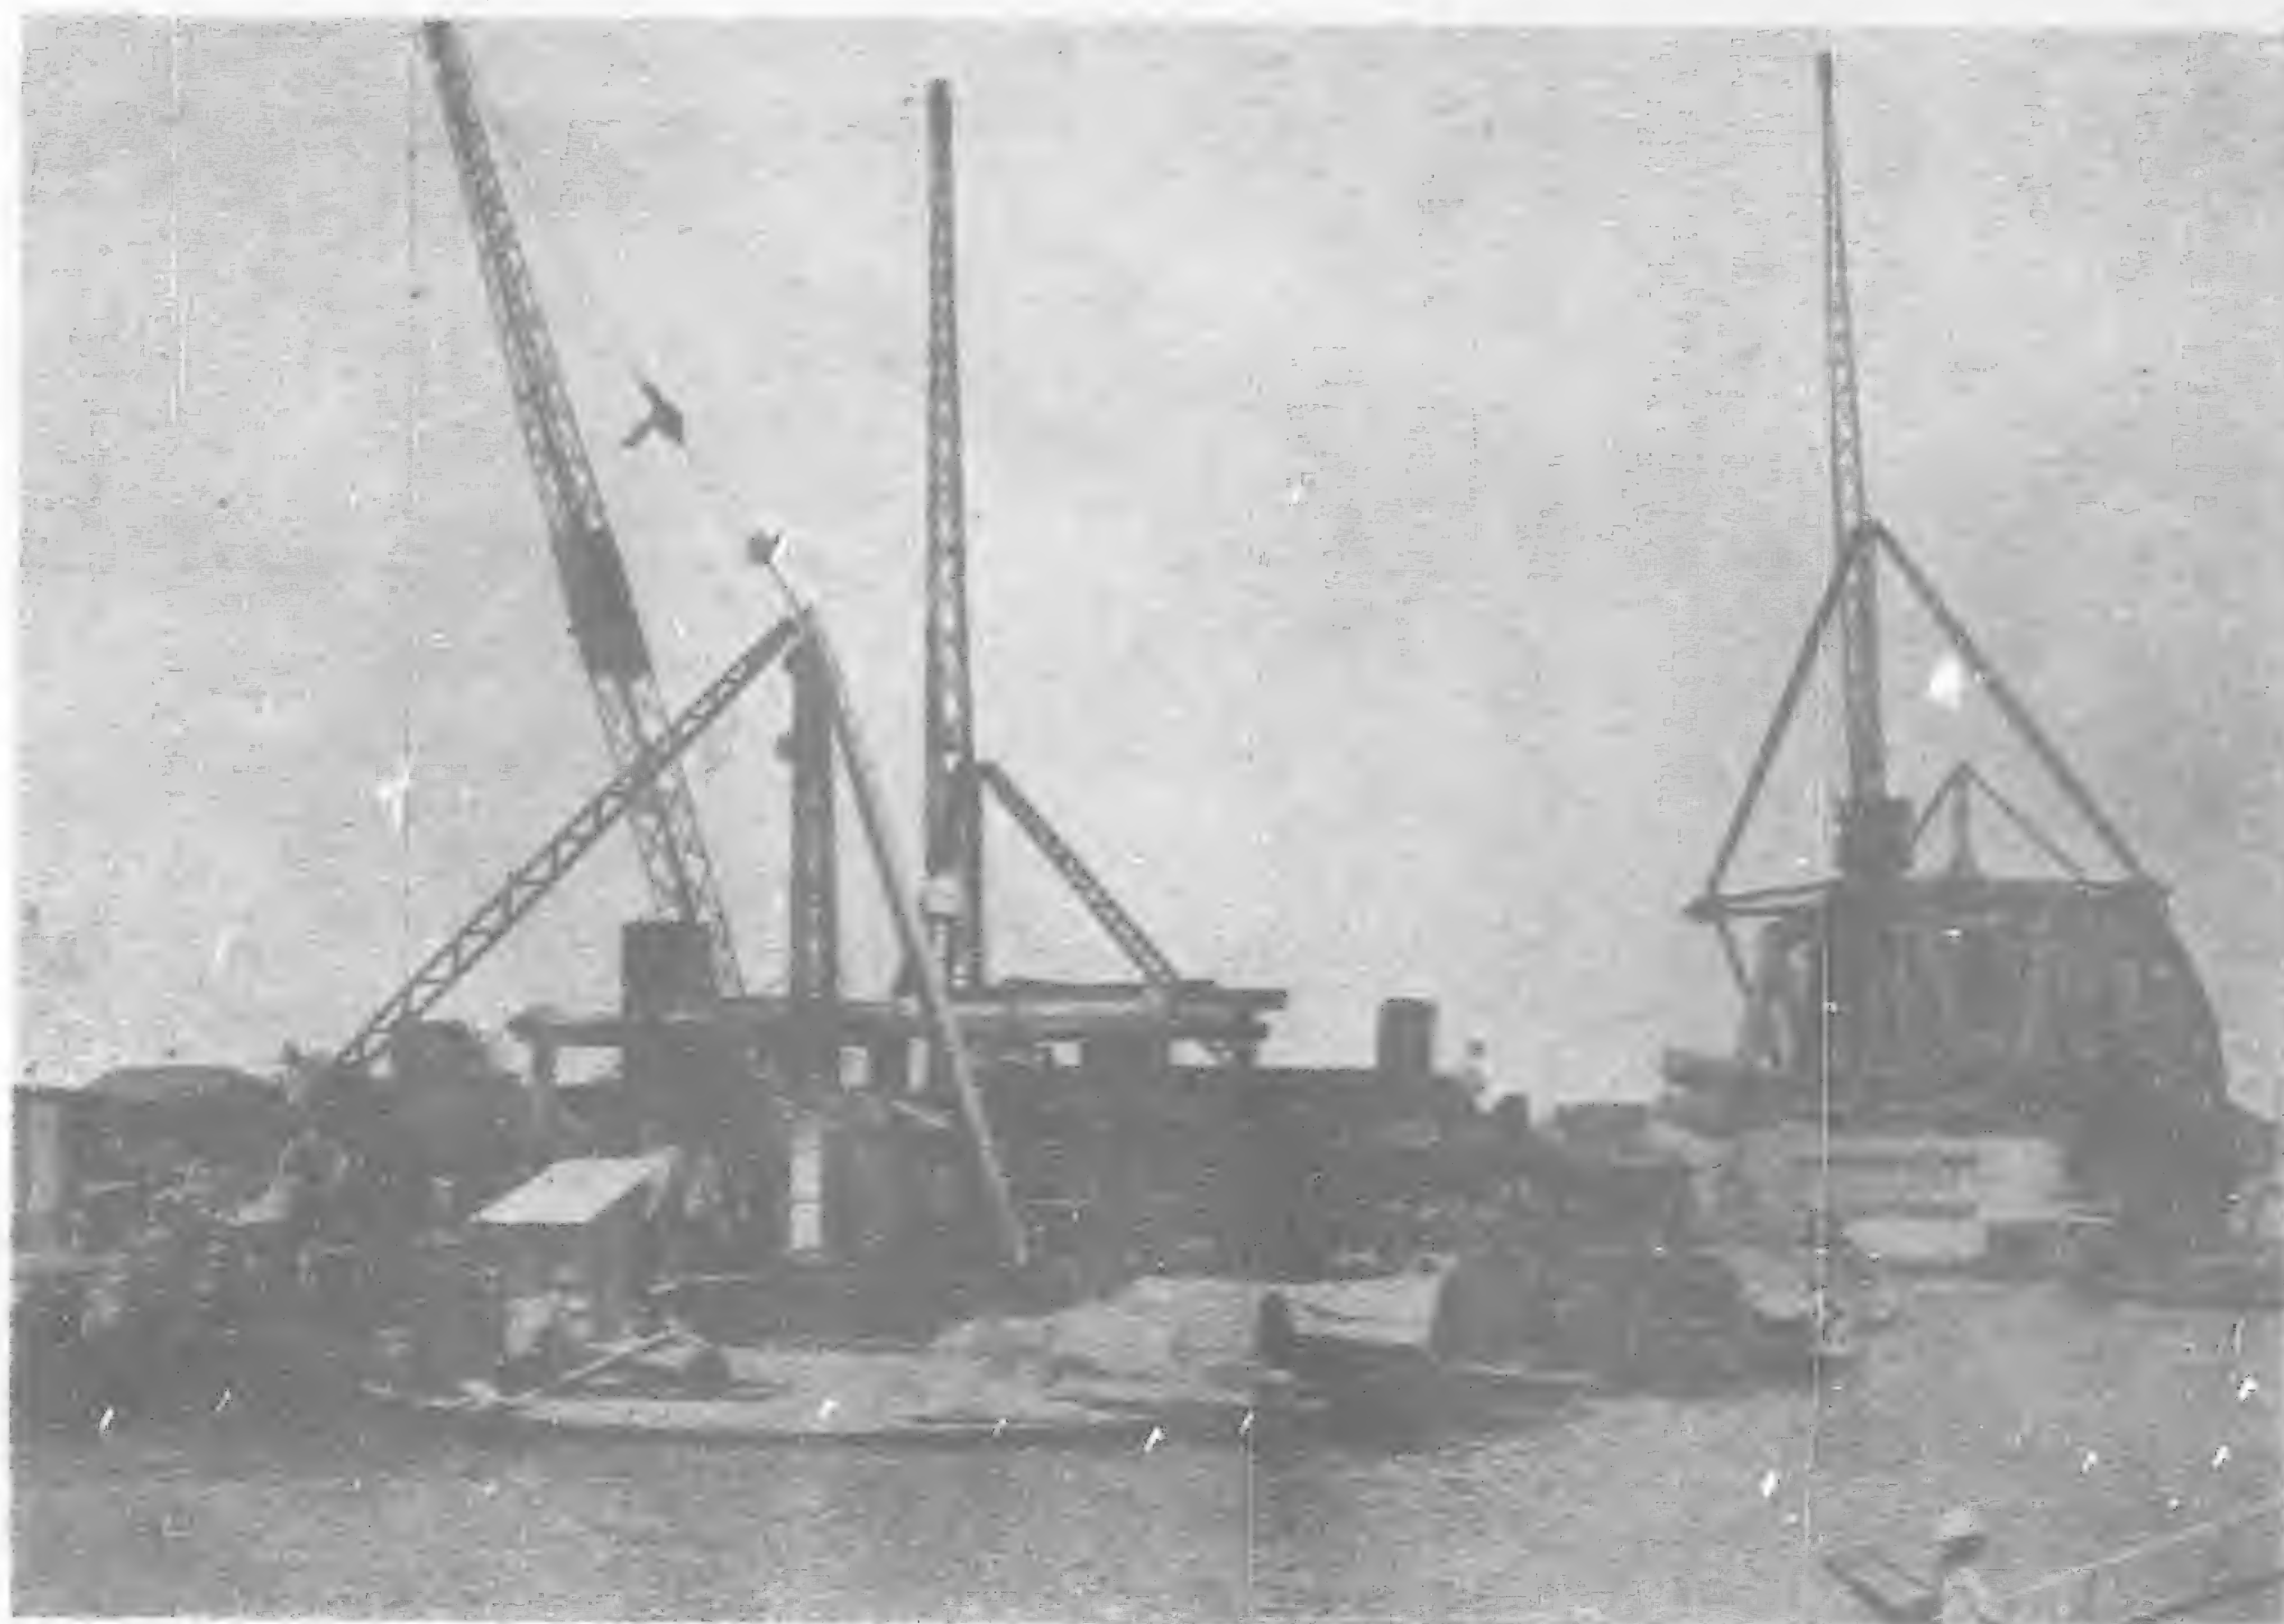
Sinking of the West Caisson and Erection of Piers
